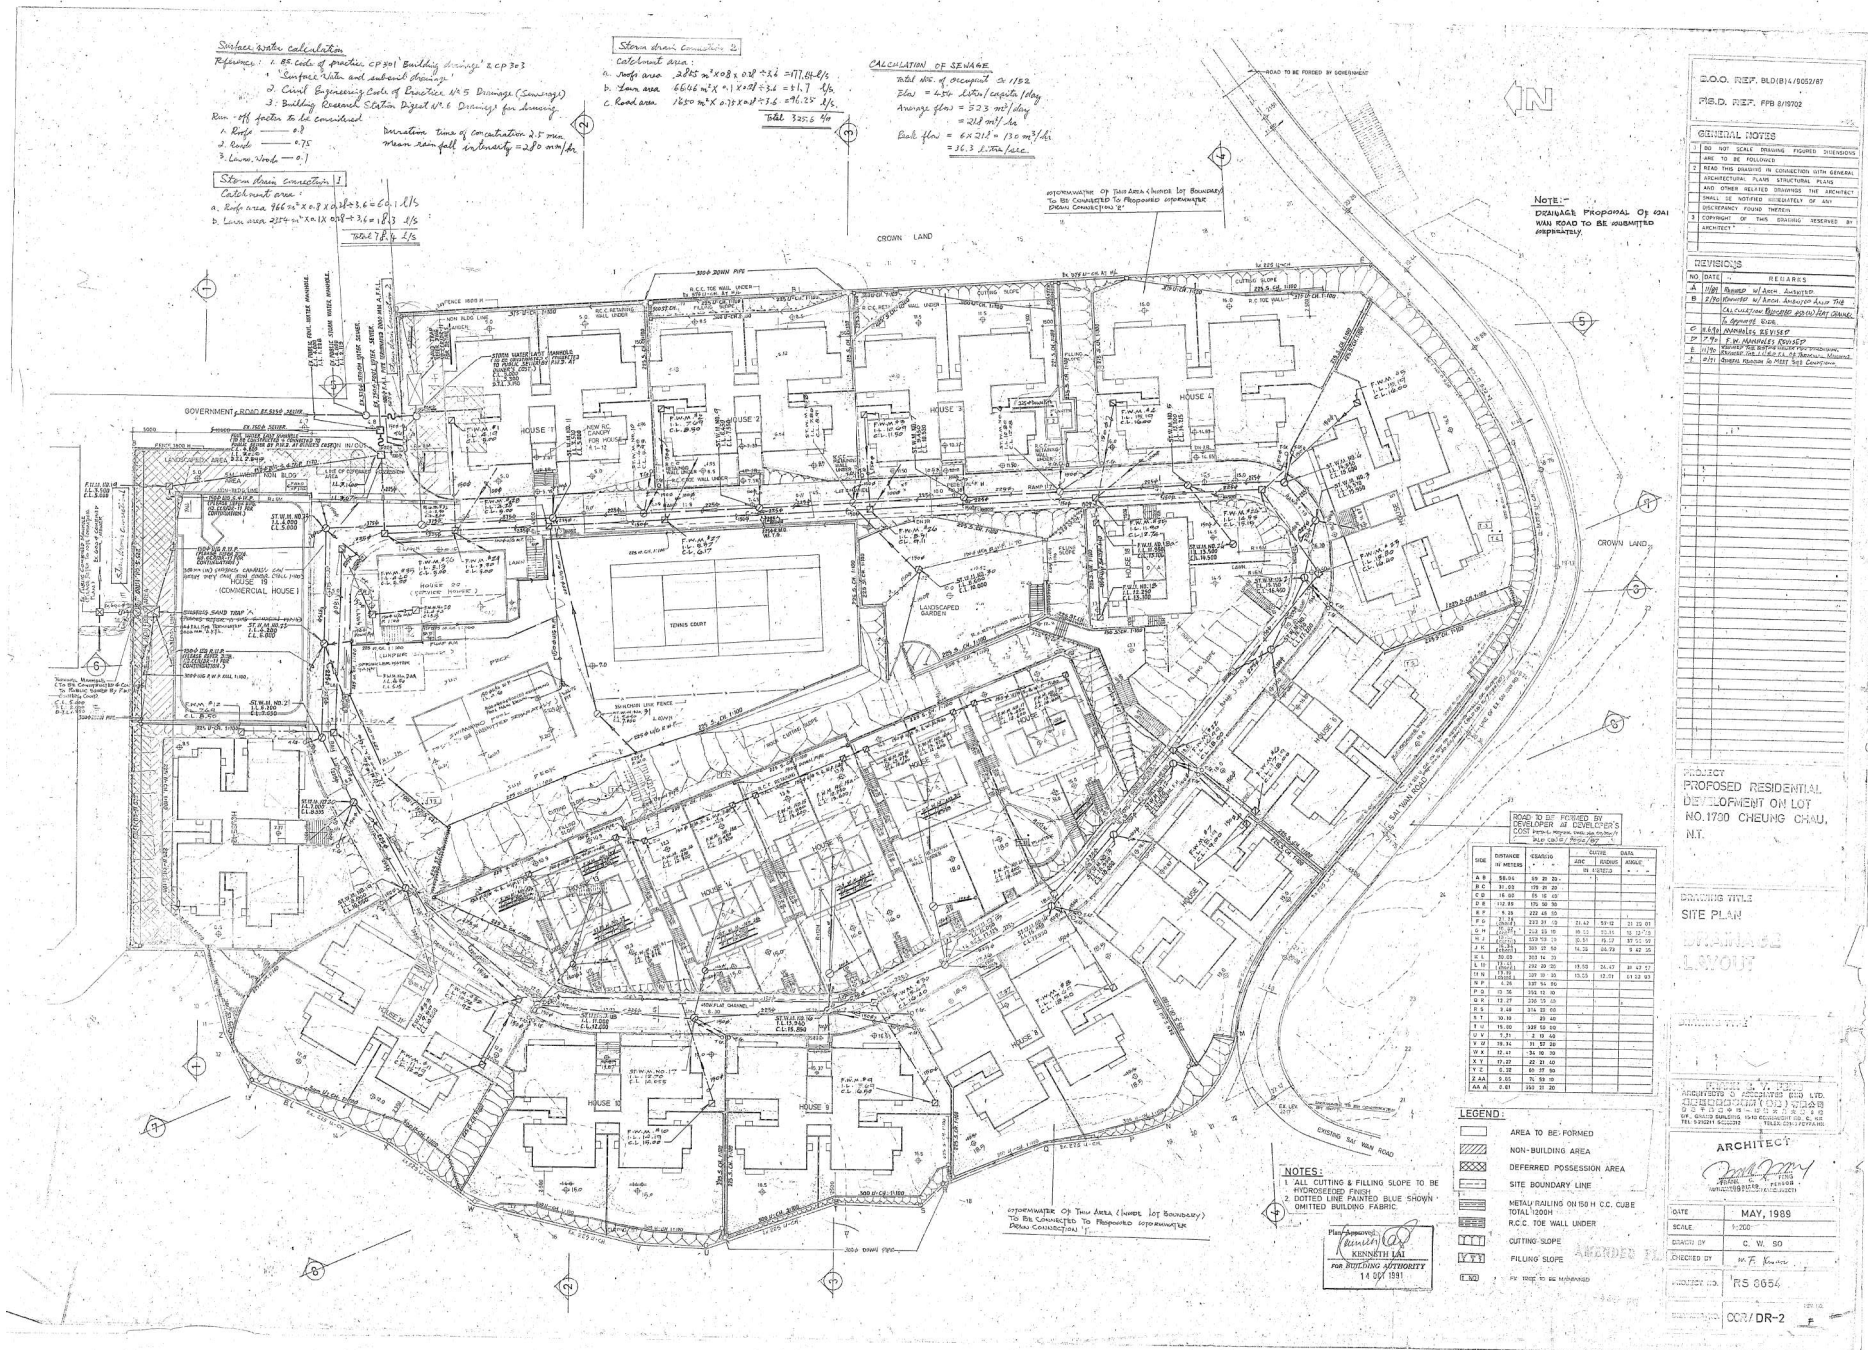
DRAINAGE PLAN OF GREENERY CREST RETRIEVED FROM BD
